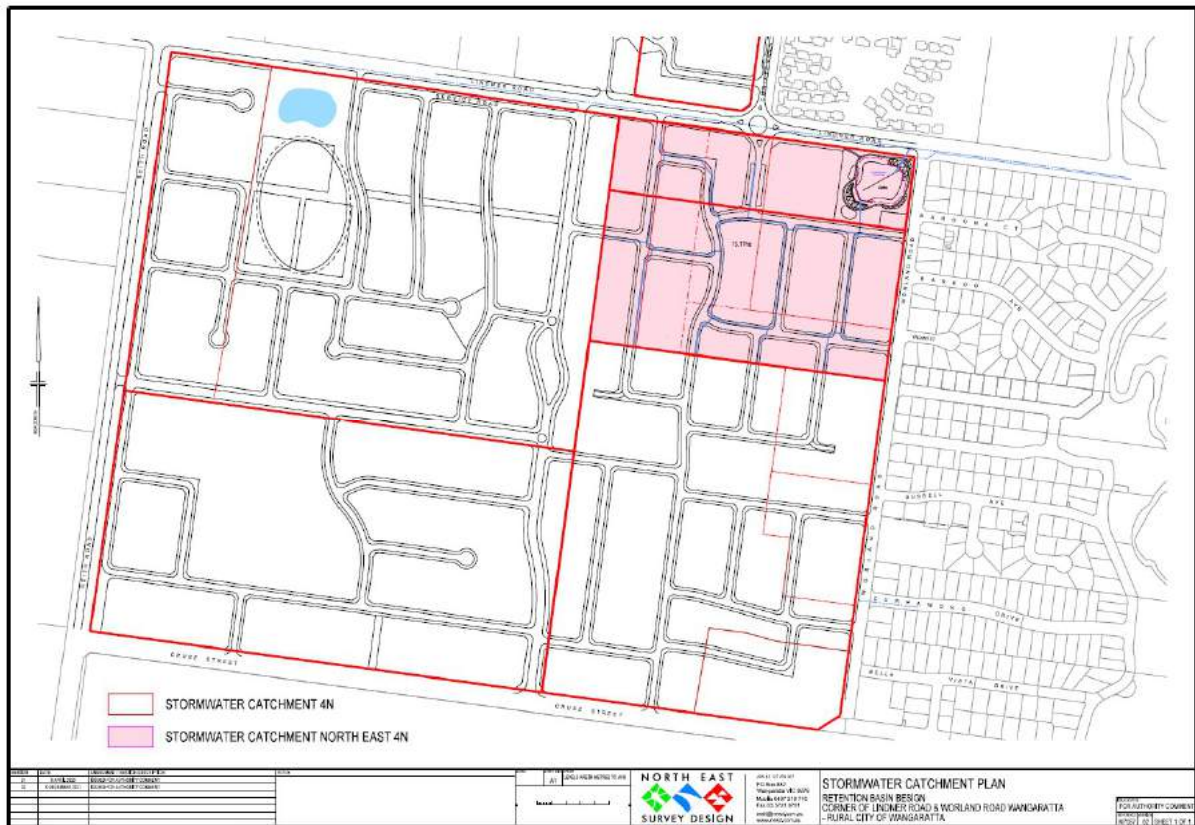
Stormwater Management Plan – SMC at 2 – 8 Worland Road – Sheet 1 of 1
